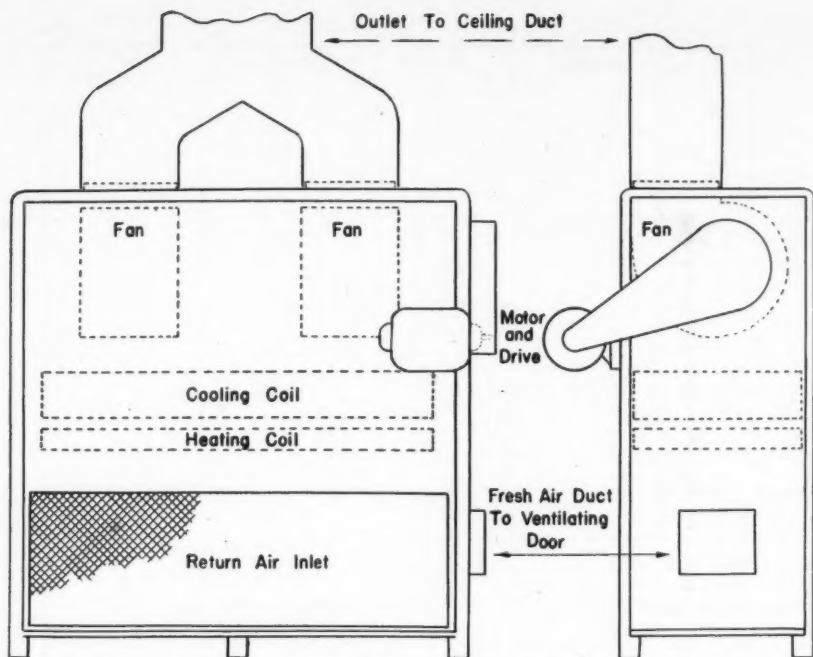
Floor type forced-air unit with heating and cooling coil, showing outlet duct connection and fresh air intake duct.
